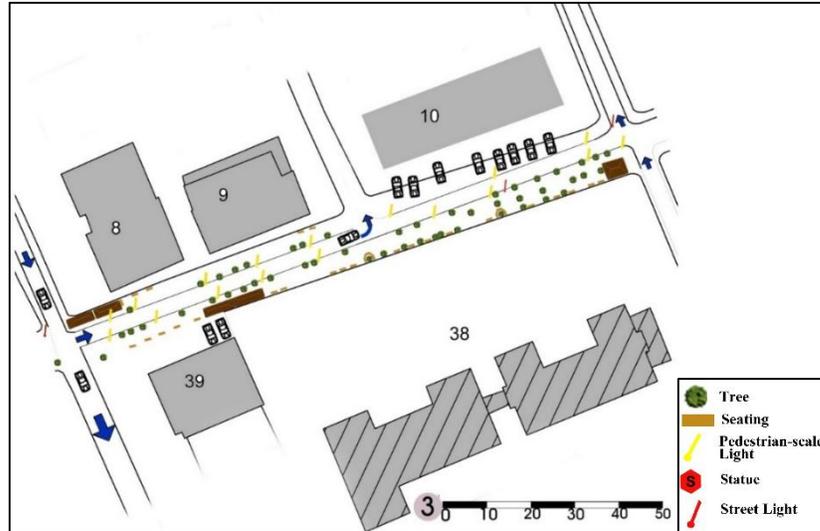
Plan of Yüksel Street showing 'Segment 3'.
